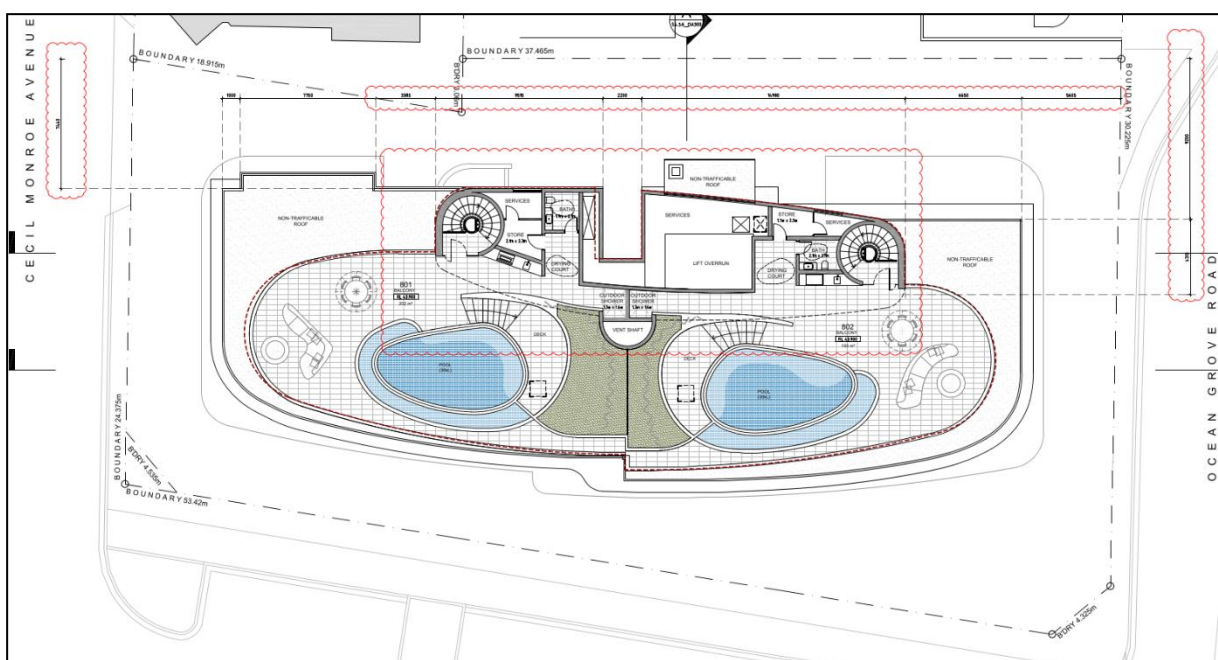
MA21/0080 approved rooftop / pool area (source: MA21/0080 approved plans)
